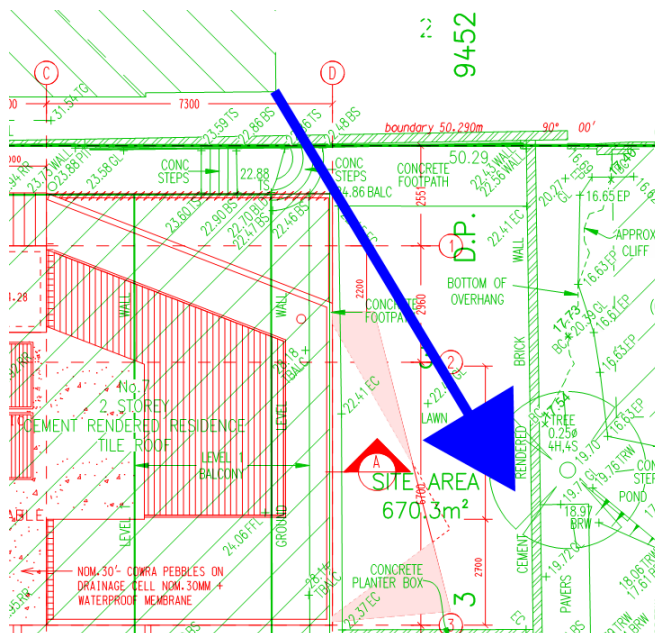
Overlay of survey (green) with proposed roof plan (red) showing line-of-sight from northern neighbouring property's south-facing window.
